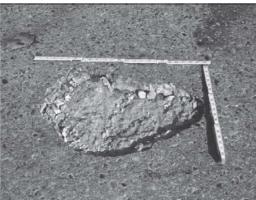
Spalls and Distressed Patches in Span 2 Deck
